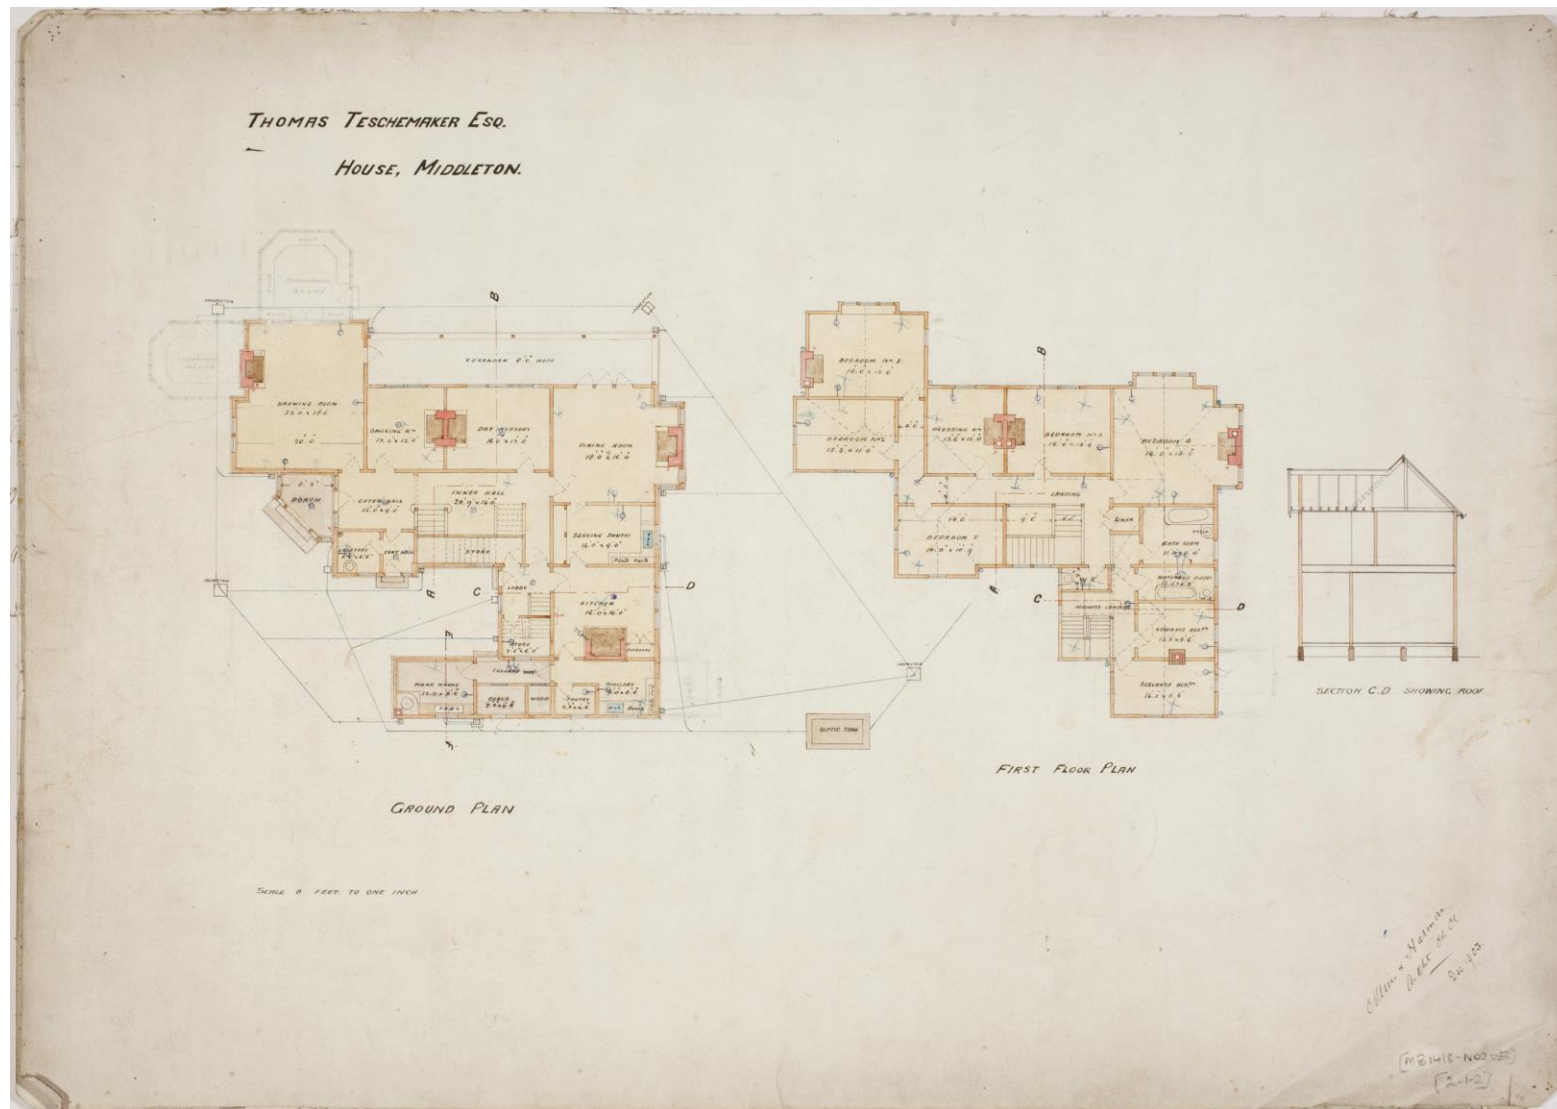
Collins and Harman, Thomas Teschemaker, Esq., House, Middleton, plans and section (1903).
